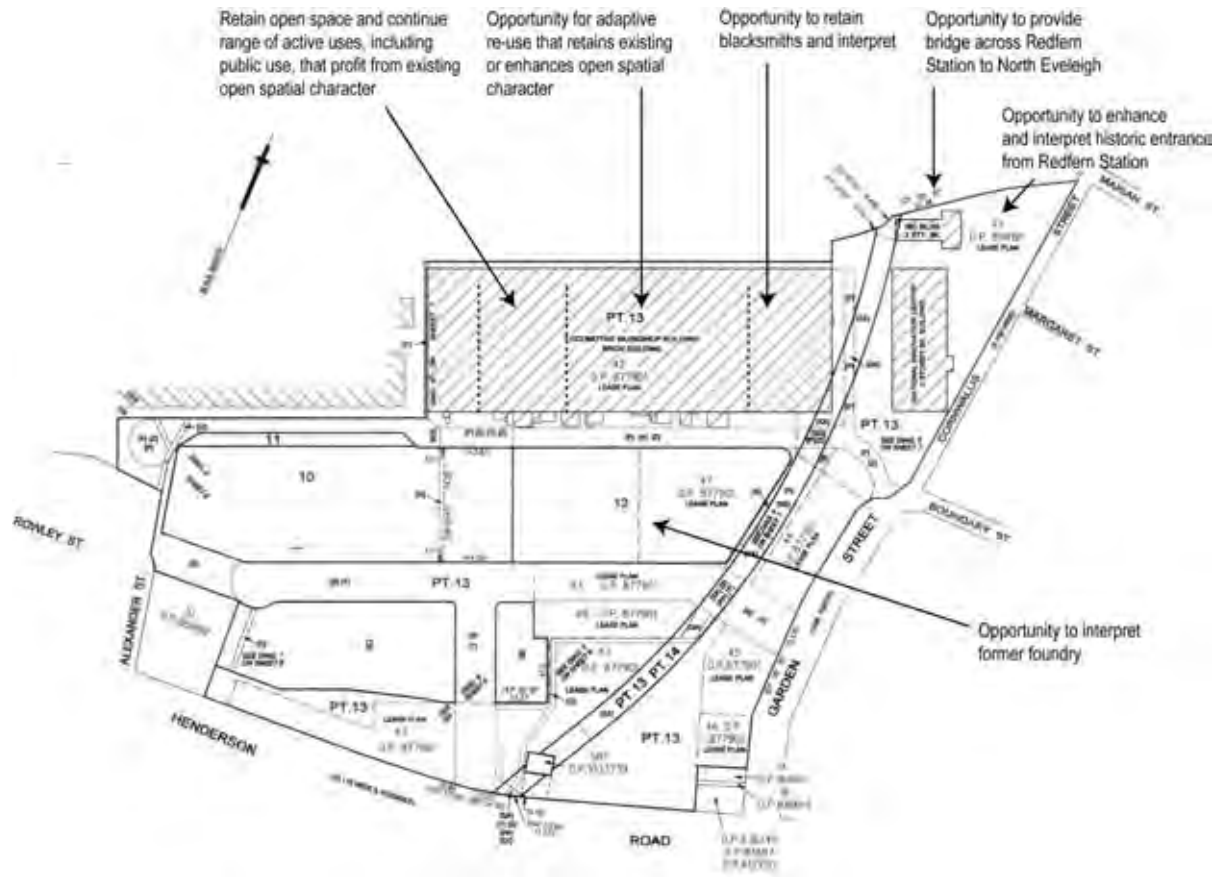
Plan showing key development opportunities at the ATP site and development parcels defined in the approved ATP subdivision plan. (Source: ATPSL, with GML additions 2010)
